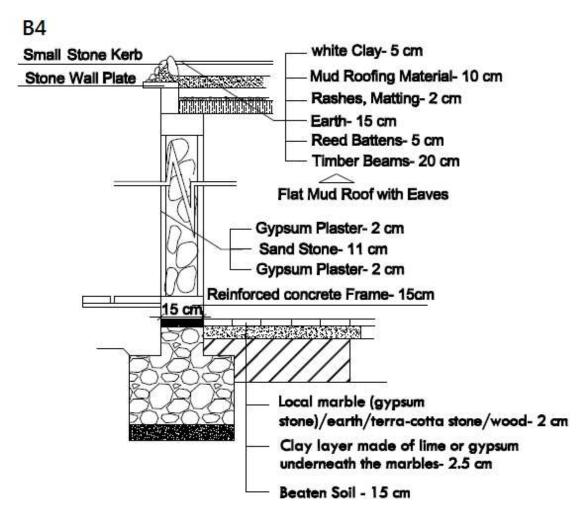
Construction Technique in British period- Stone walls and Concrete Structure- B₄
